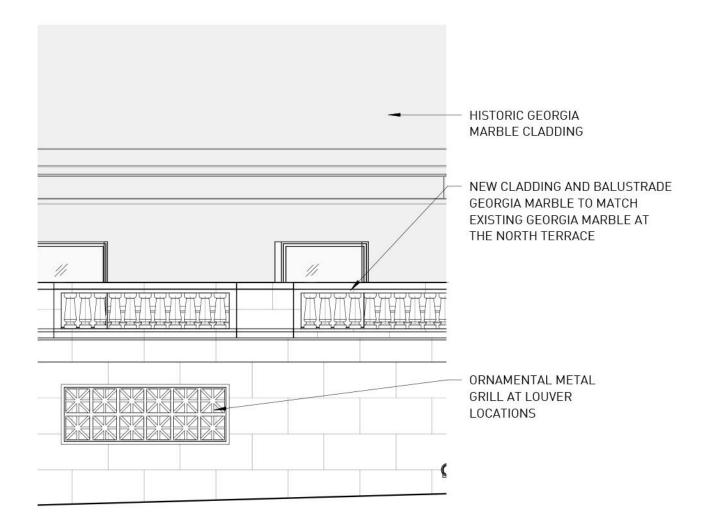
NORTH TERRACE DETAIL ELEVATION
